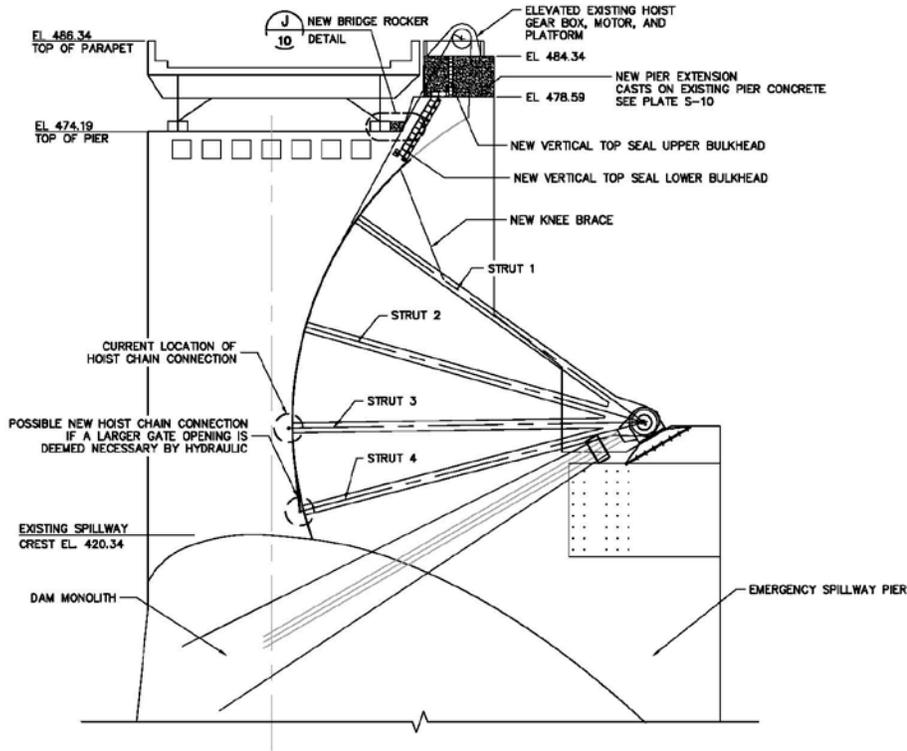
Preliminary drawing of emergency spillway gate top seal and vertical pier extensions (U.S. Army Corps of Engineers, January 2013). Elevations are given in NAVD88 datum.
